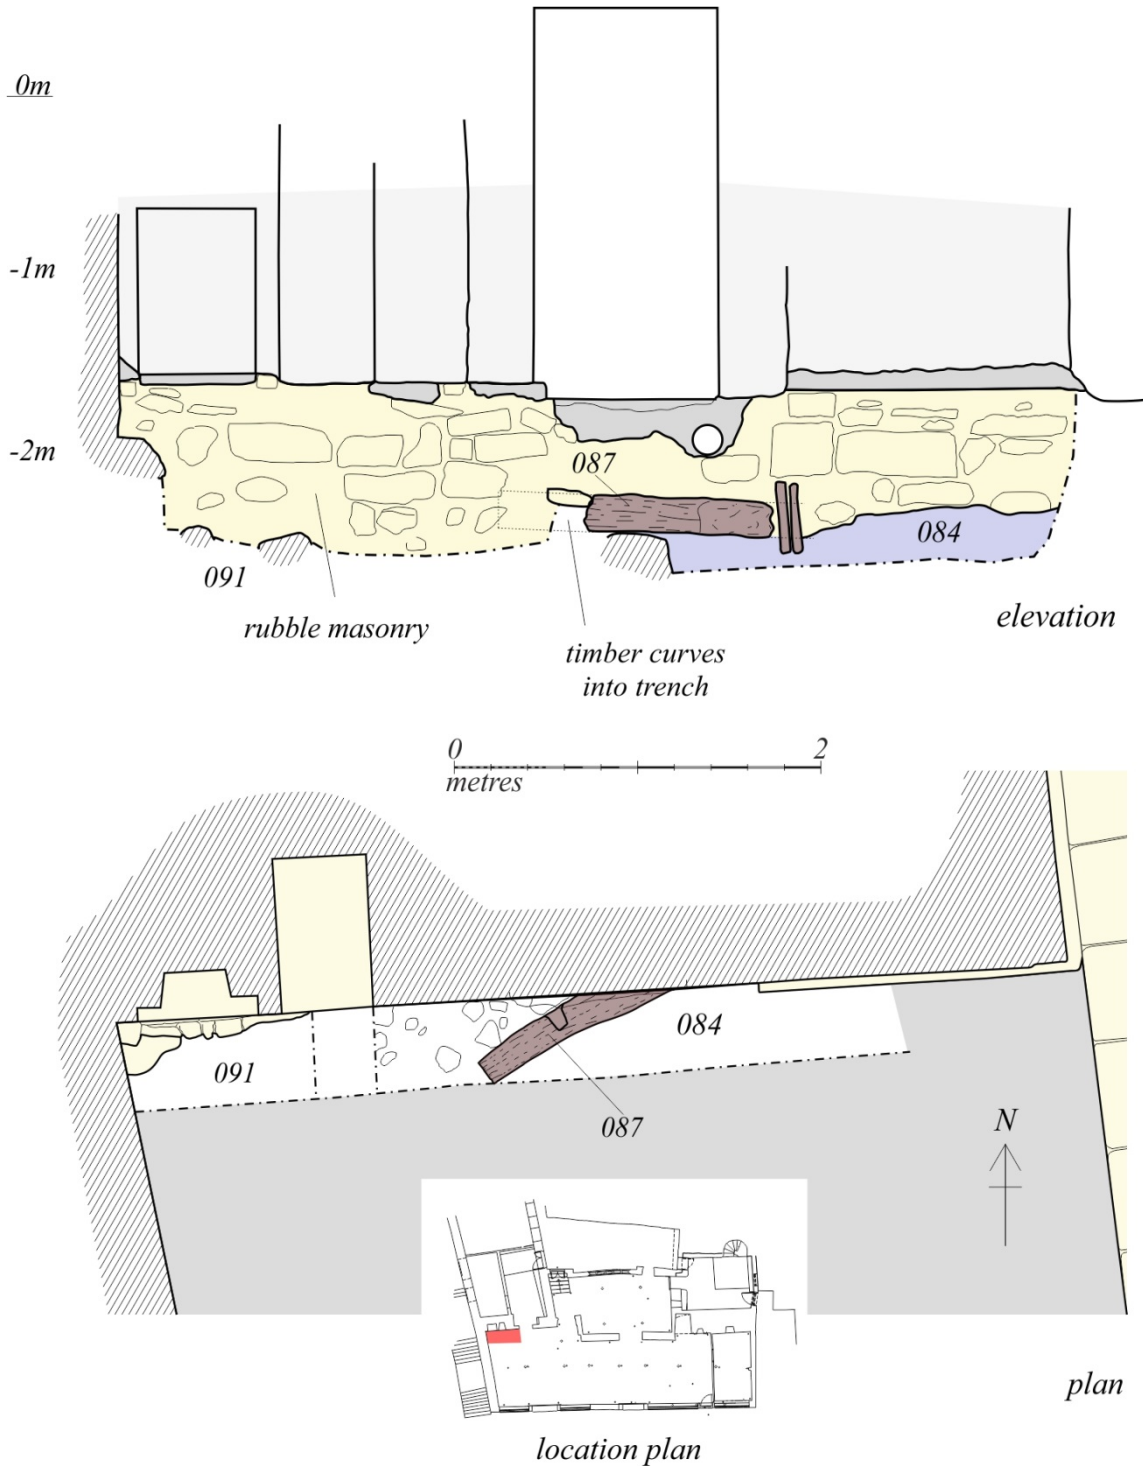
Elevation (top) and plan (bottom) of front room strip foundation trench
